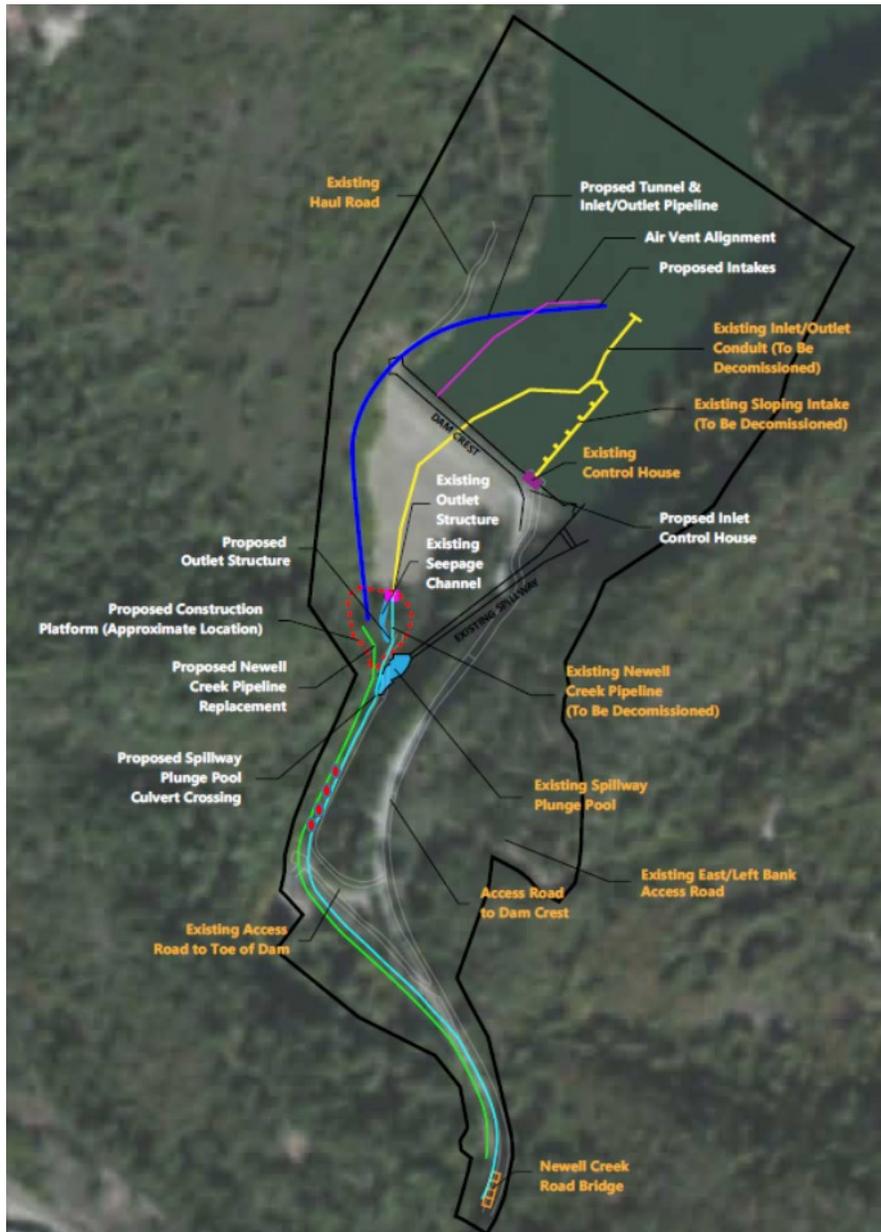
Map of existing and proposed project facilities/components for the Newell Creek Dam Inlet/Outlet Replacement Project. The red dots downstream of the plunge pool are the approximate locations of the existing failed log weirs proposed for replacement as part of Mitigation Project 3.
